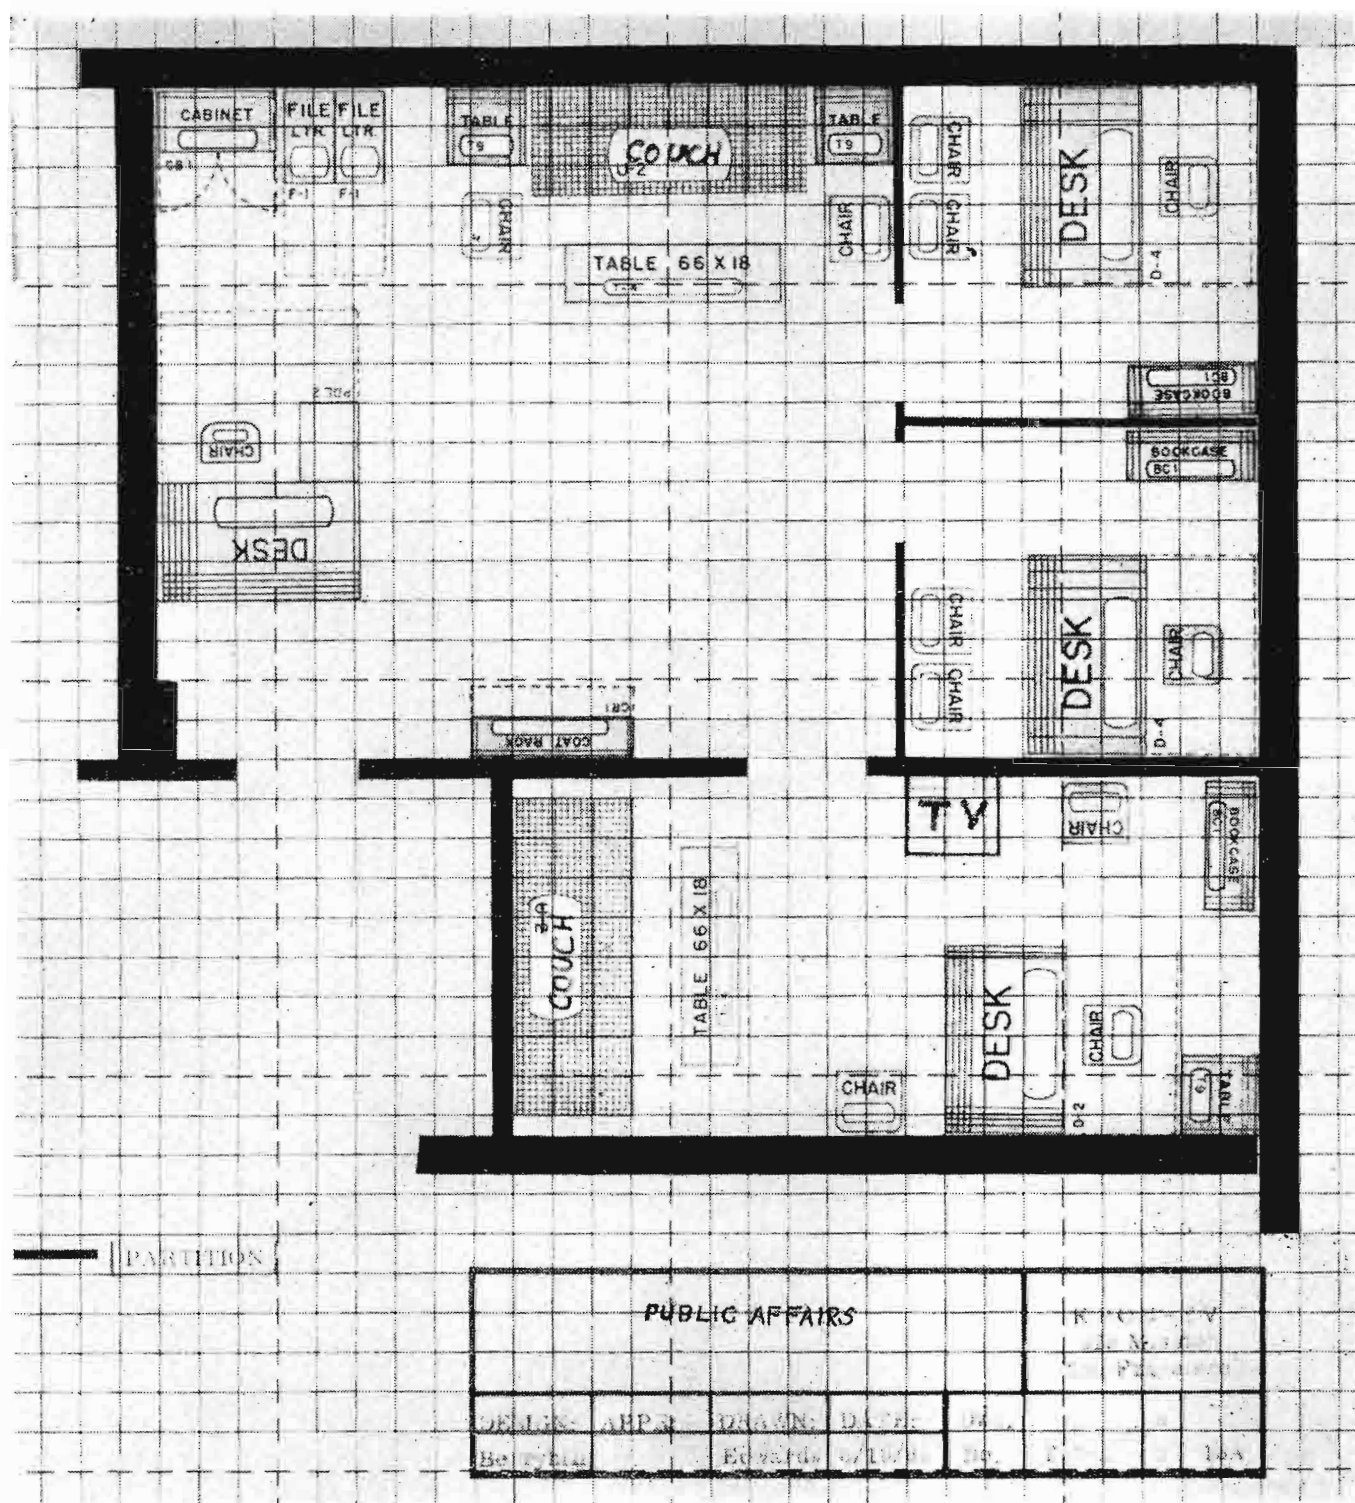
(Left) One of the departmental "templates" used in planning the KRON-TV building — this one shows the floor layout of the space allocated to the Public Affairs activity.
